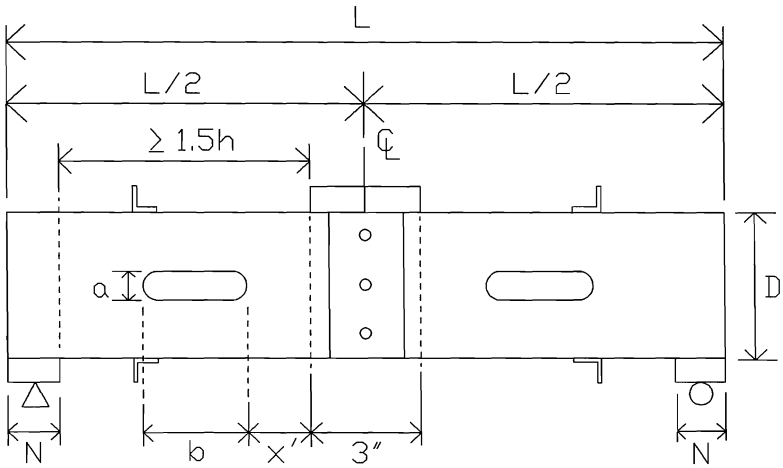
Test Setup for Combined Bending and Shear Test Specimens
